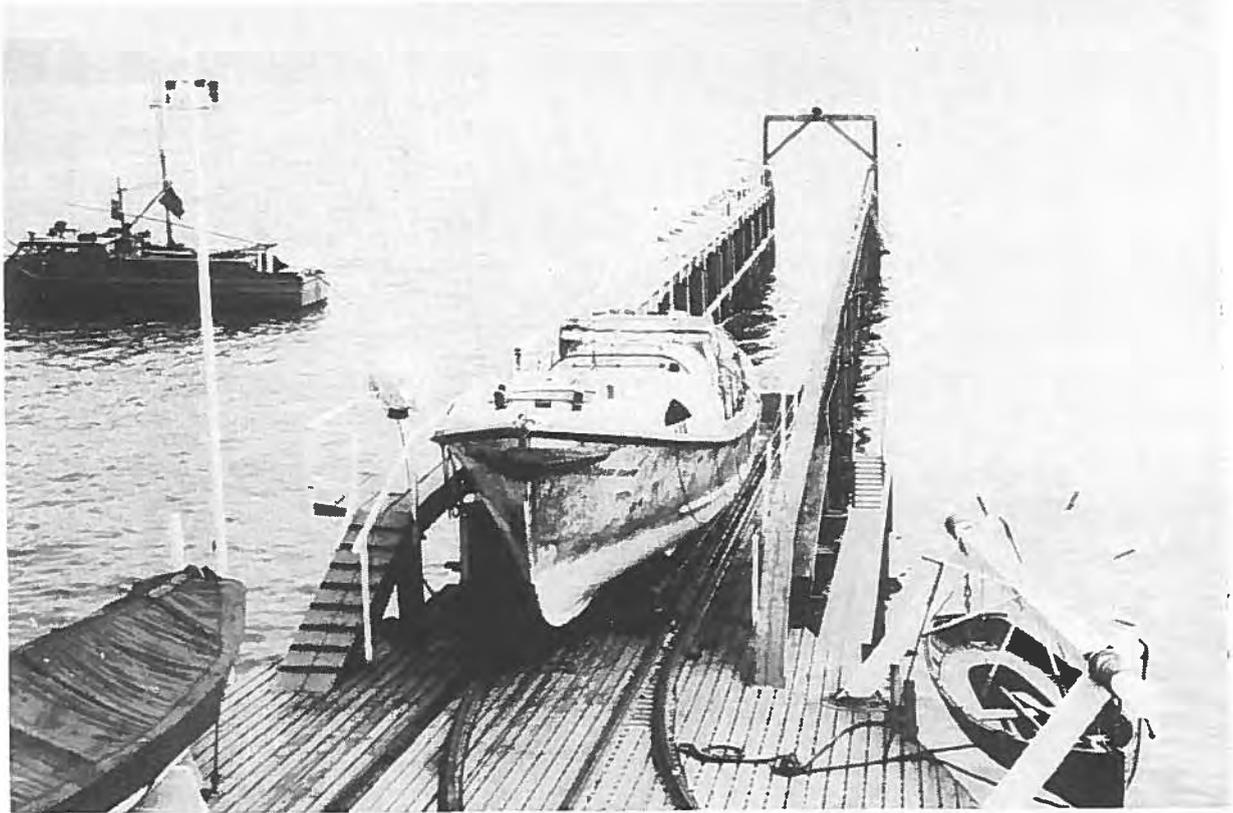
New footwalk and guardrail, west side of the launchway, 1943. (NPS)
